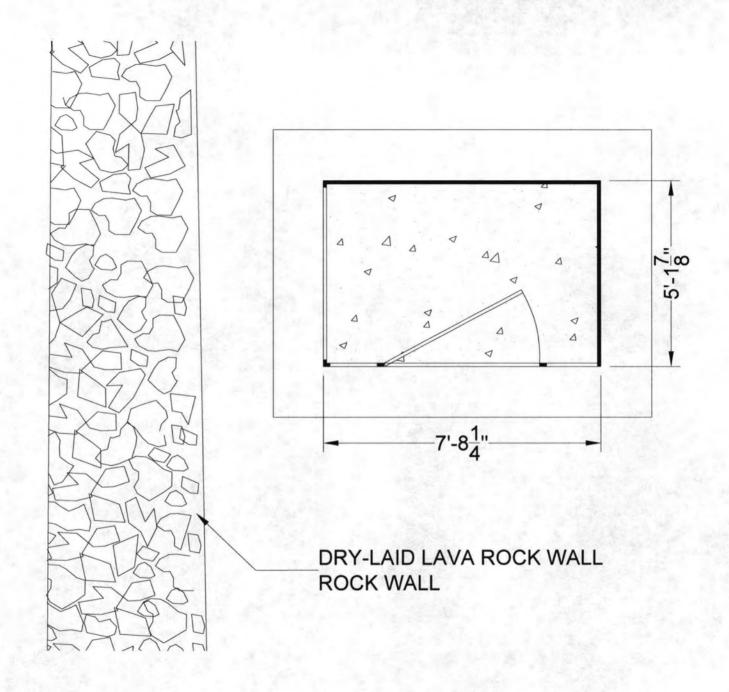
FIGURE J - BUILDING 6, BIRD CAGE/CAT COOP SHED FLOOR PLAN
